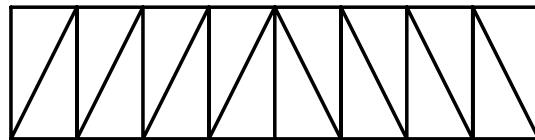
Pratt Truss Lateral Bracing Pattern
